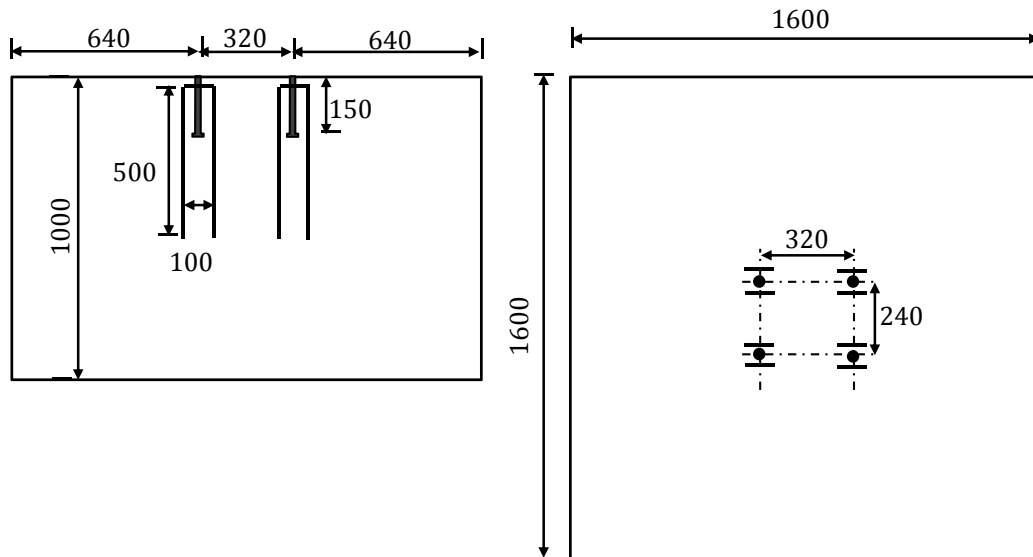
Headed studs and supplementary reinforcement configuration
